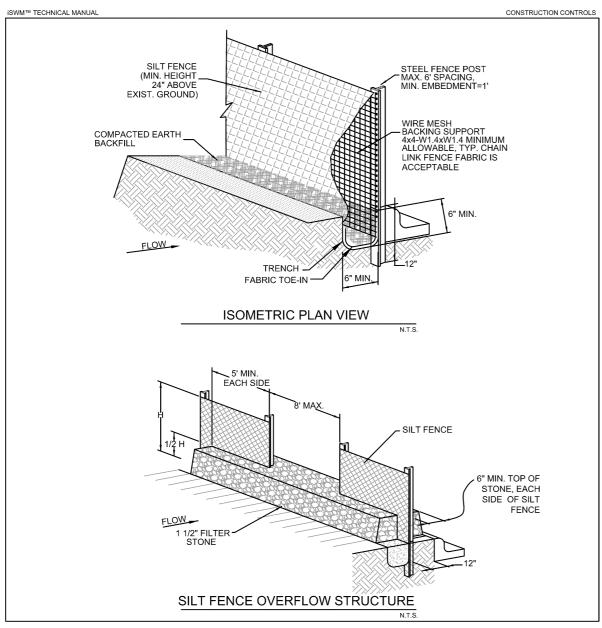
STANDARD CONSTRUCTION DETAIL - FOR SILT FENCE (1 OF 2)
